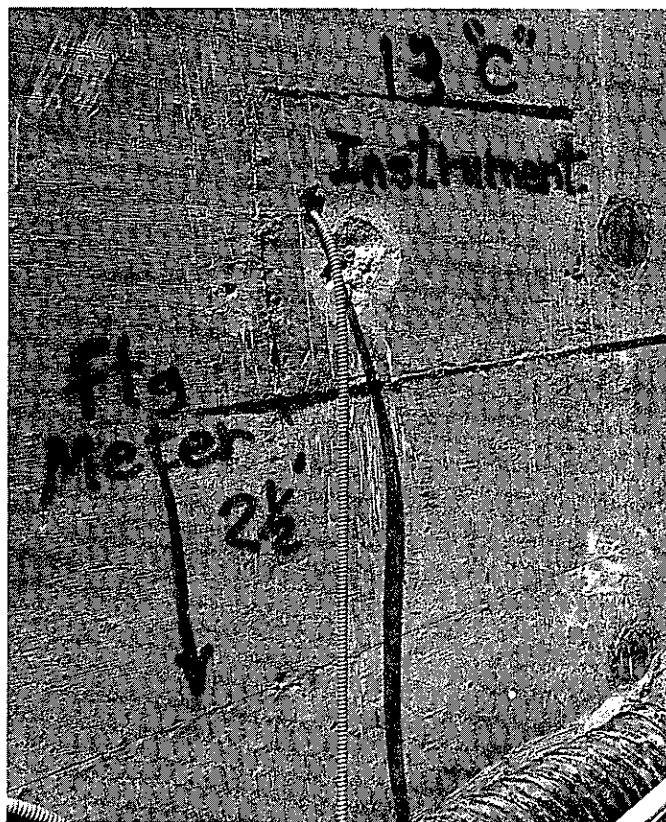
Soil pressure cell lead wires routed through culvert wall.
